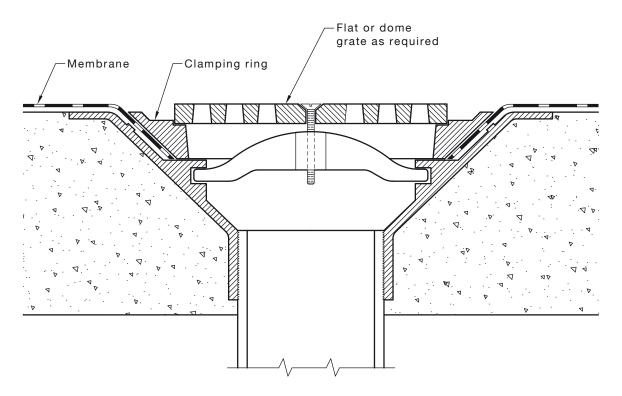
DRAINAGE DETAIL FOR AN EXPOSED MEMBRANE
